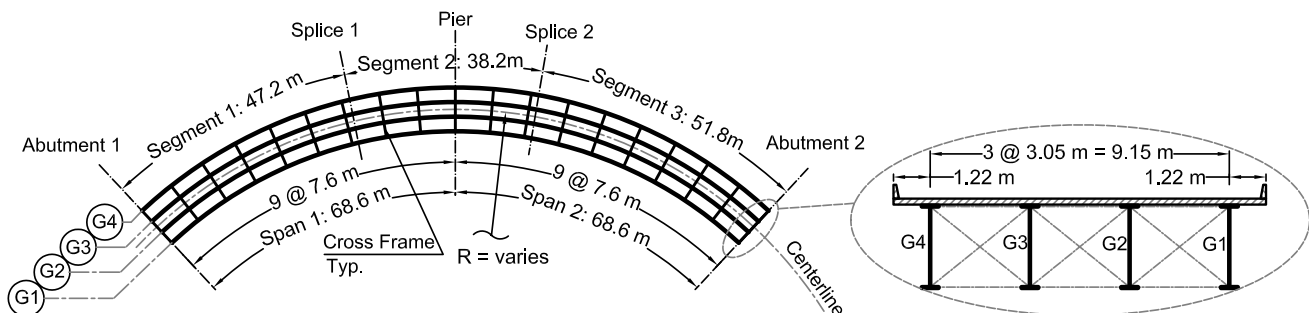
Framing plan and cross section for bridge models with varying radii of curvature
